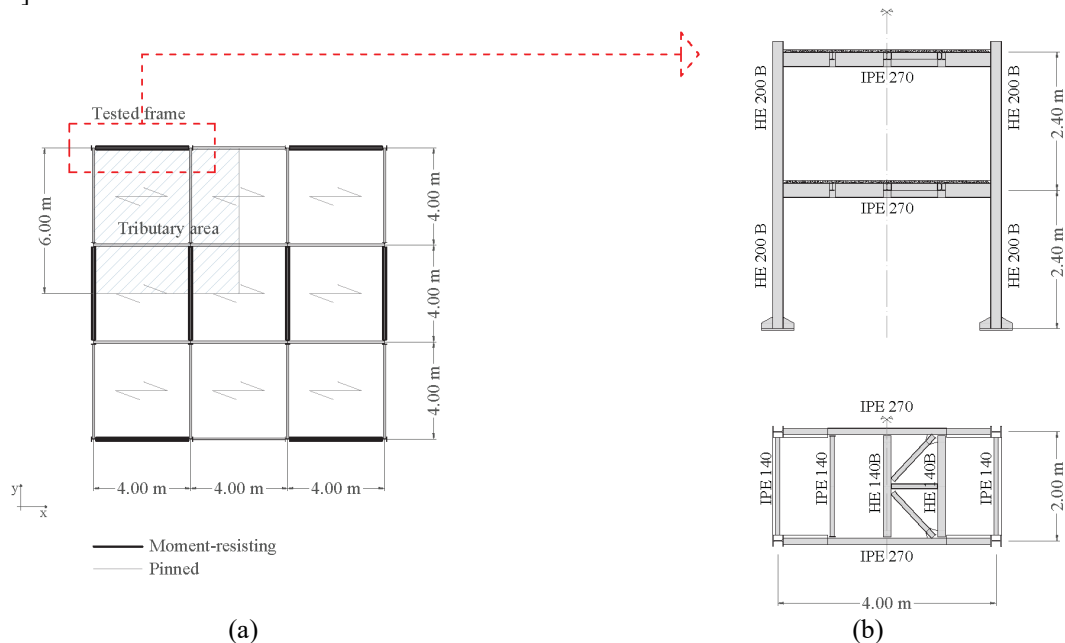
Case-study building: (a) Plan view of the prototype structure; (b) Plan and elevation view of the test specimen.
